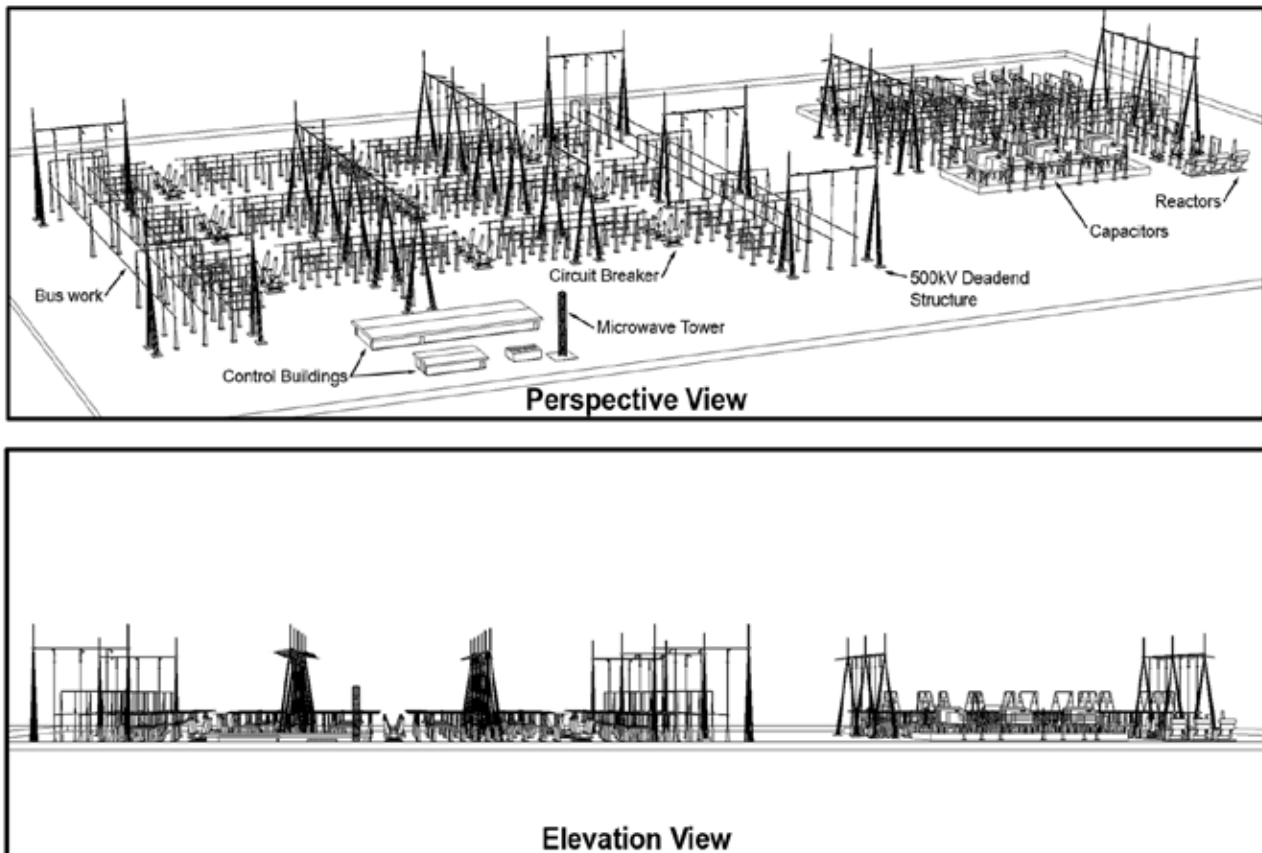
Typical 500-kV Substation Perspective and Elevation Views
